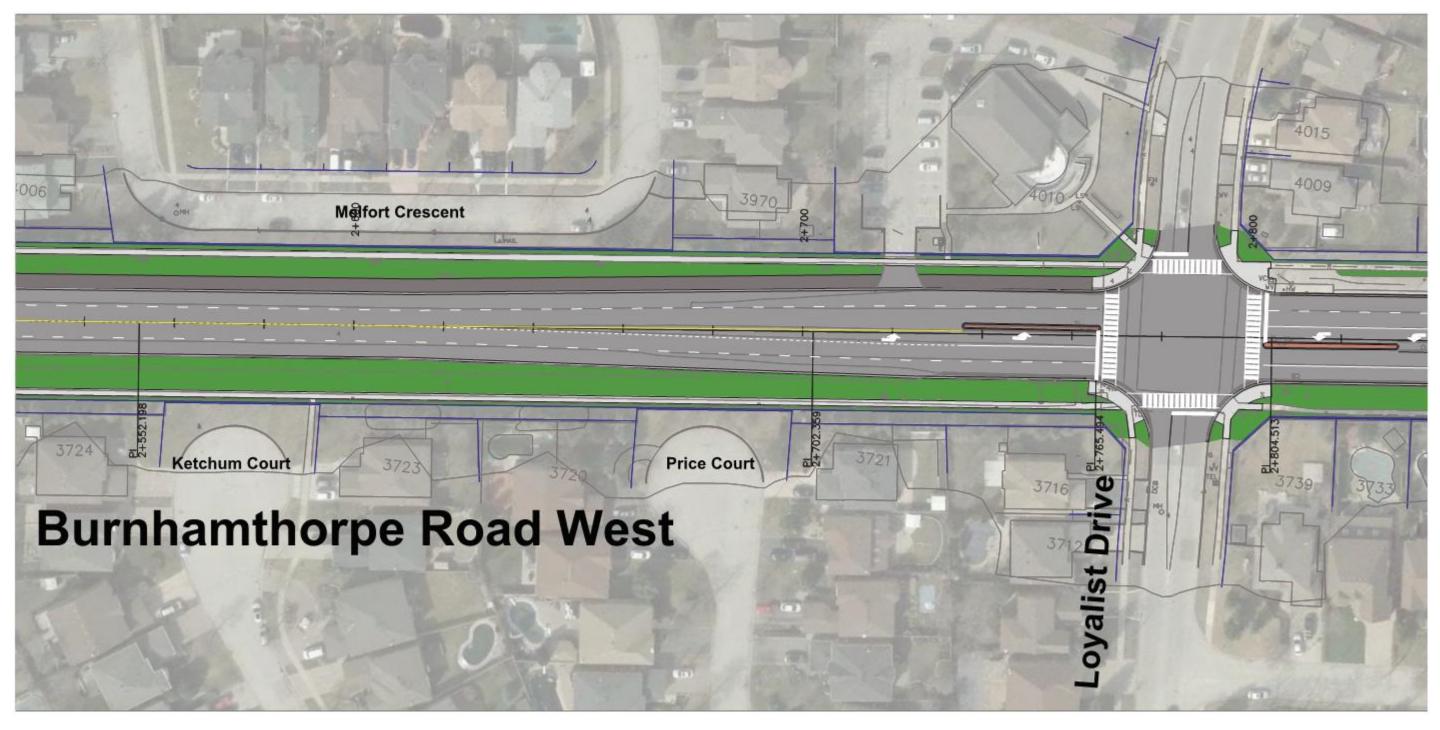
Alternative Design Concept #2 - Widen Burnhamthorpe Road West to 4 Lanes (No In-Boulevard Parking on the South Side)
